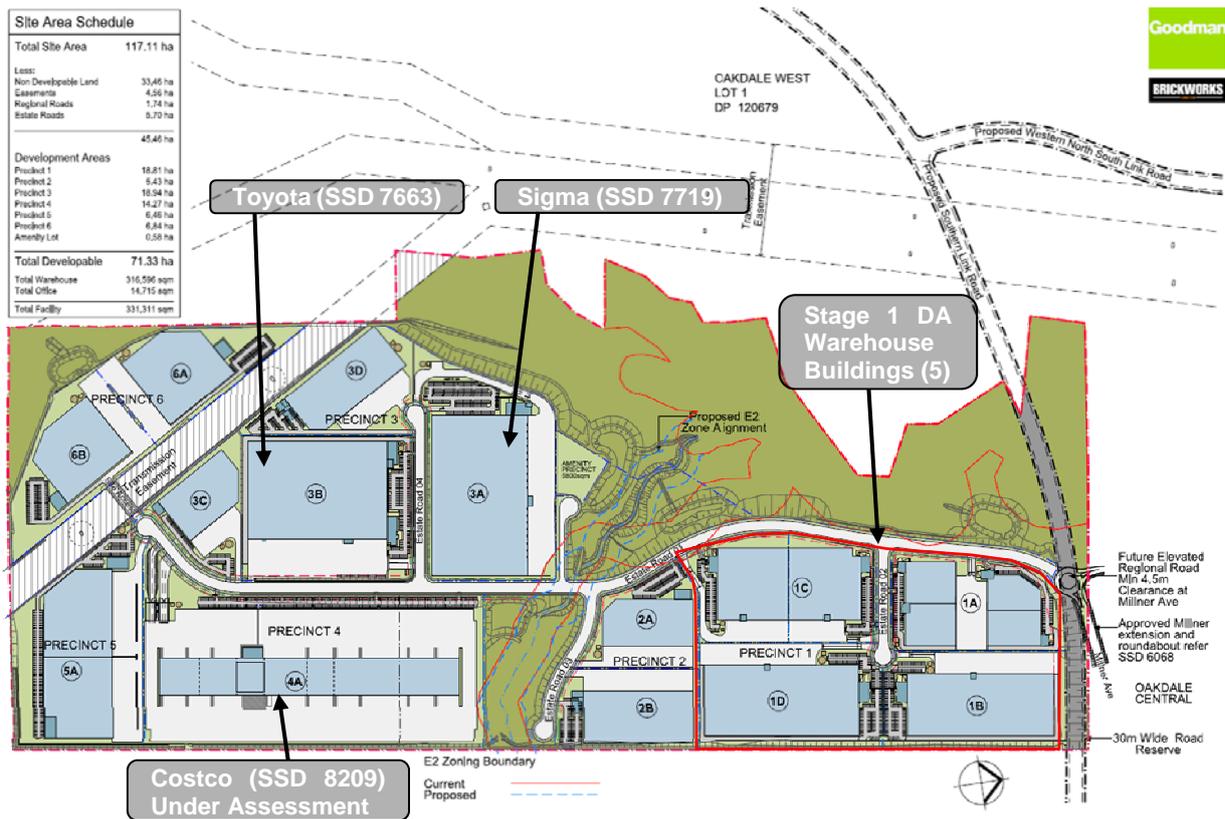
Approved Concept Proposal Layout – SSD 6917 as modified by MOD 1
